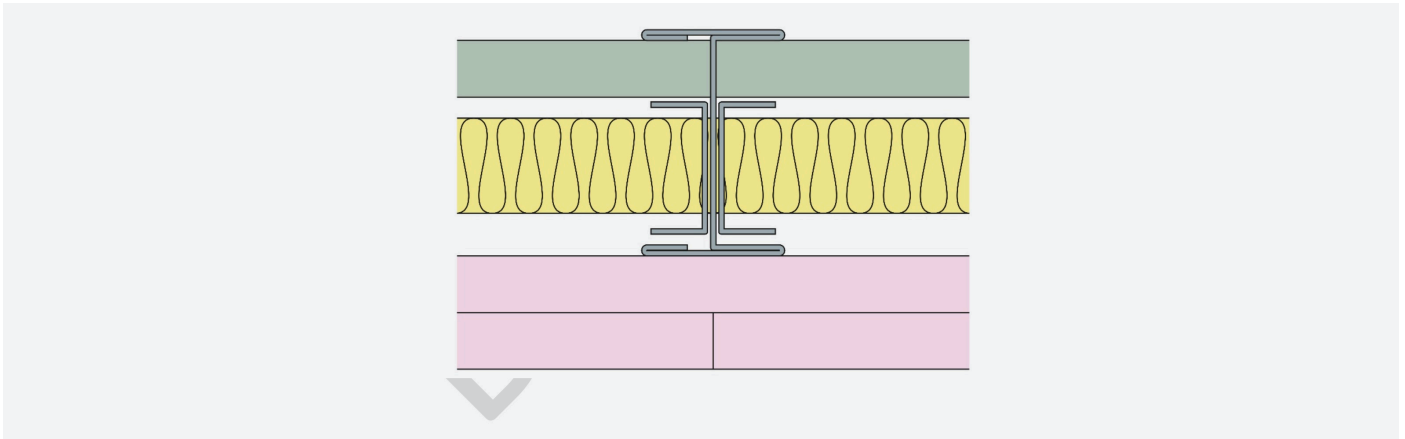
Example of Shaft Wall (Image courtesy of British Gypsum).
